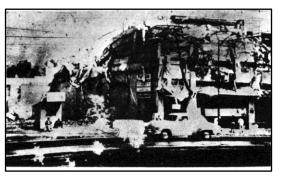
Collapse of multi storeyed concrete building during Mexico earthquake
